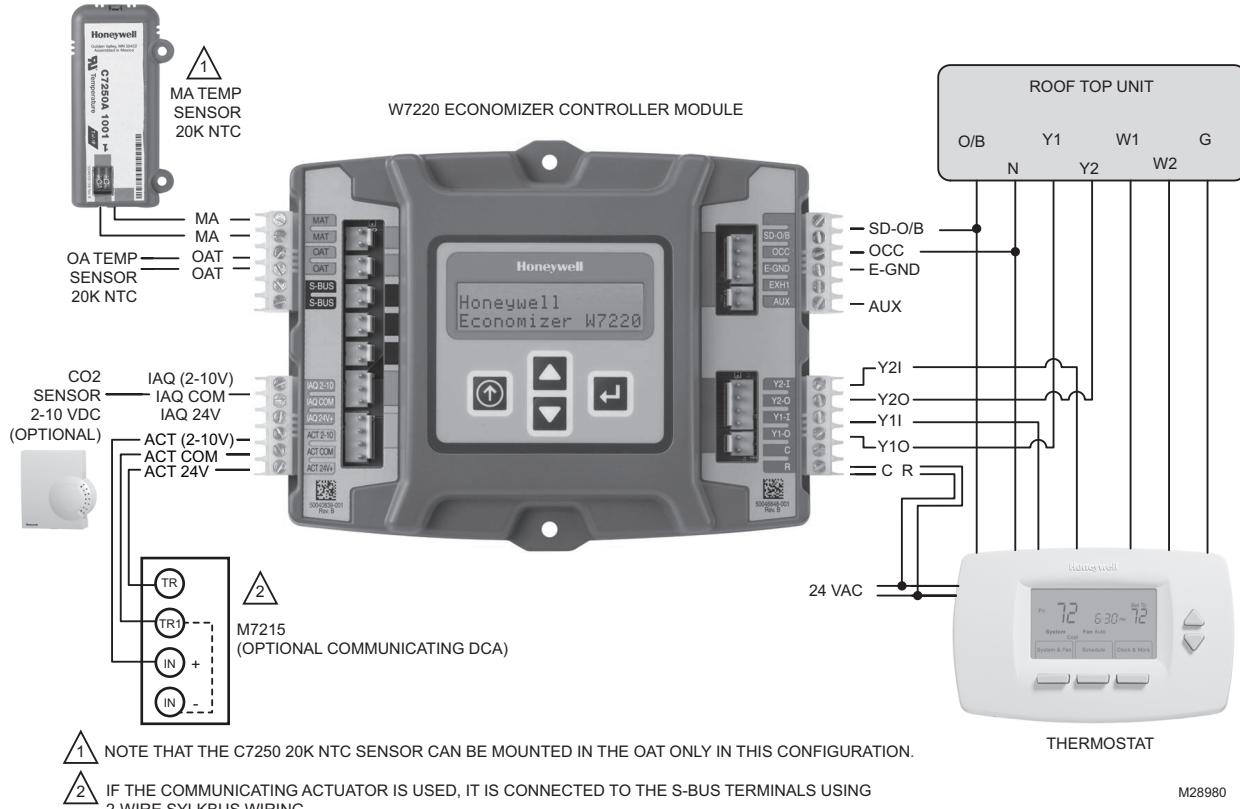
Stand-alone dry bulb Economizer configuration with black motor M7215.
